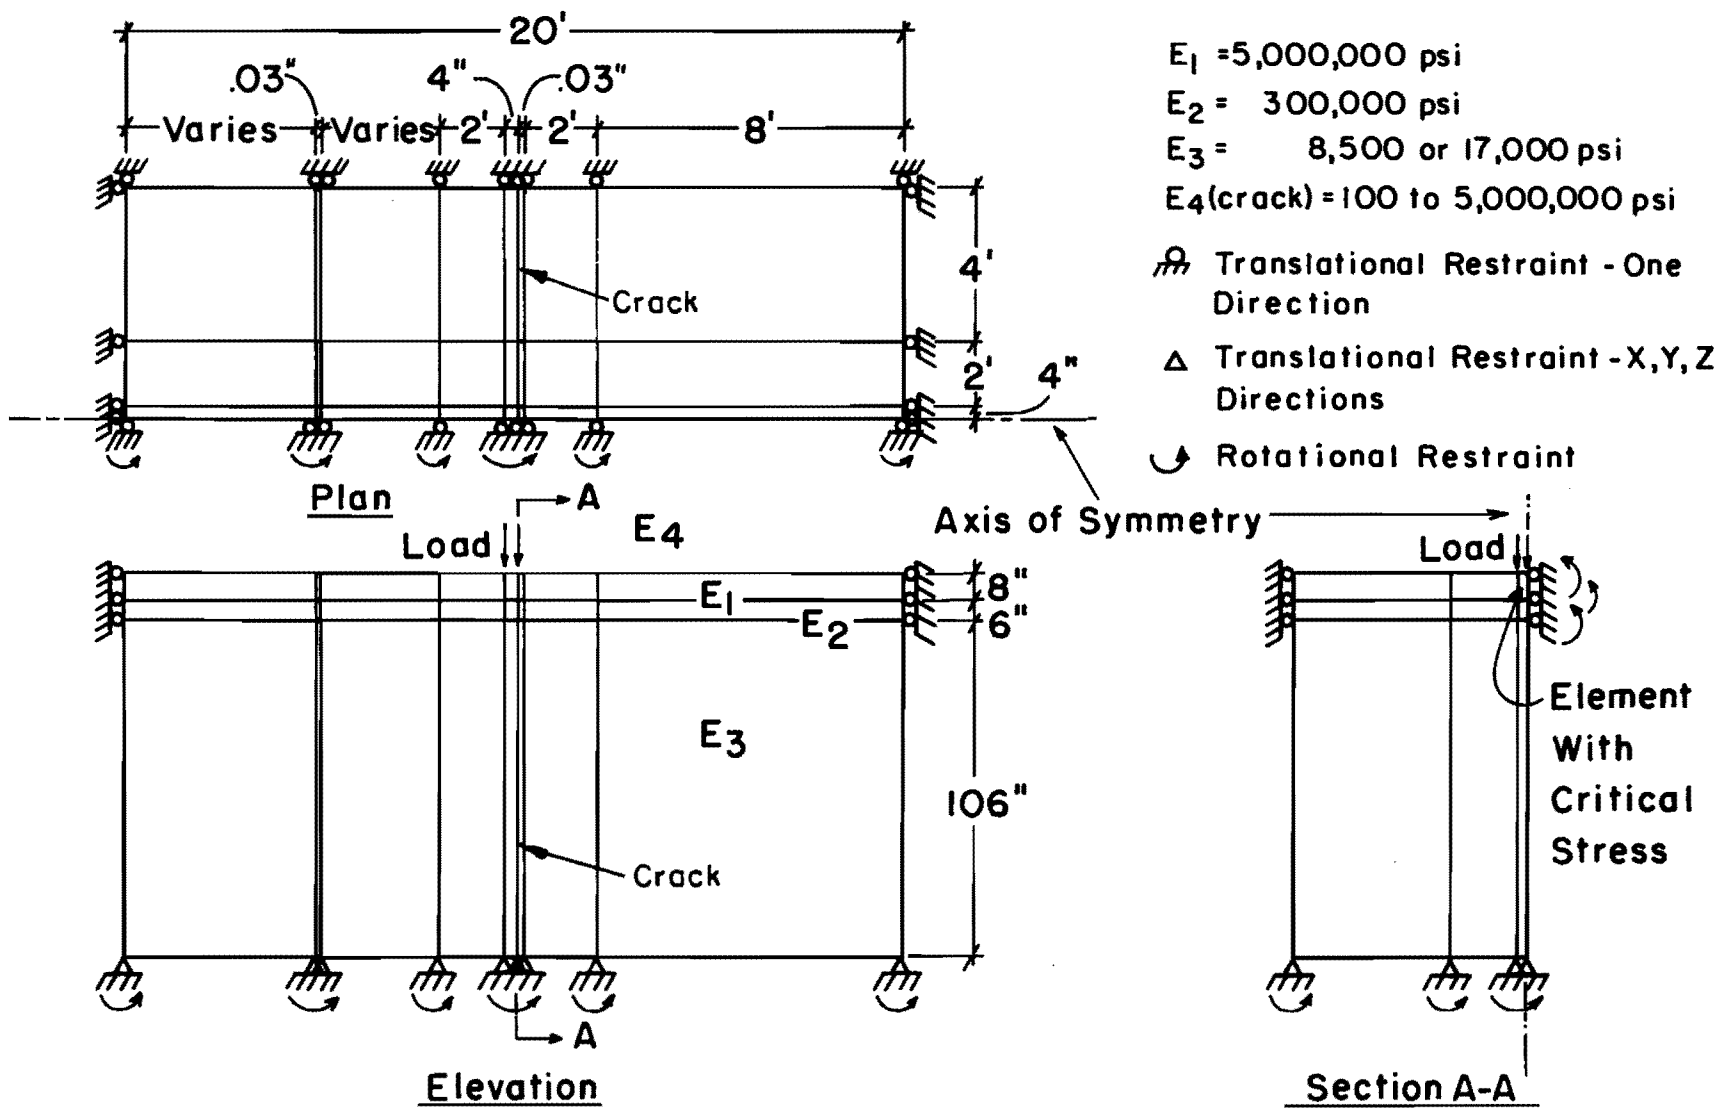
Finite element configuration for modeling stresses at the bottom of a cracked concrete pavement layer under an interior loading condition.
